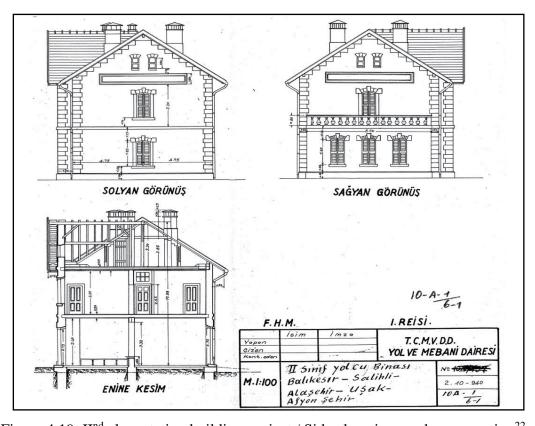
IInd class station building project / Side elevations and cross section²²
